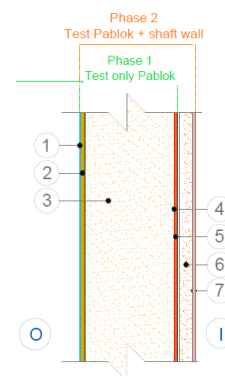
Stratigraphy of Pablok Wall (base wall) with the self-supporting wall lining
